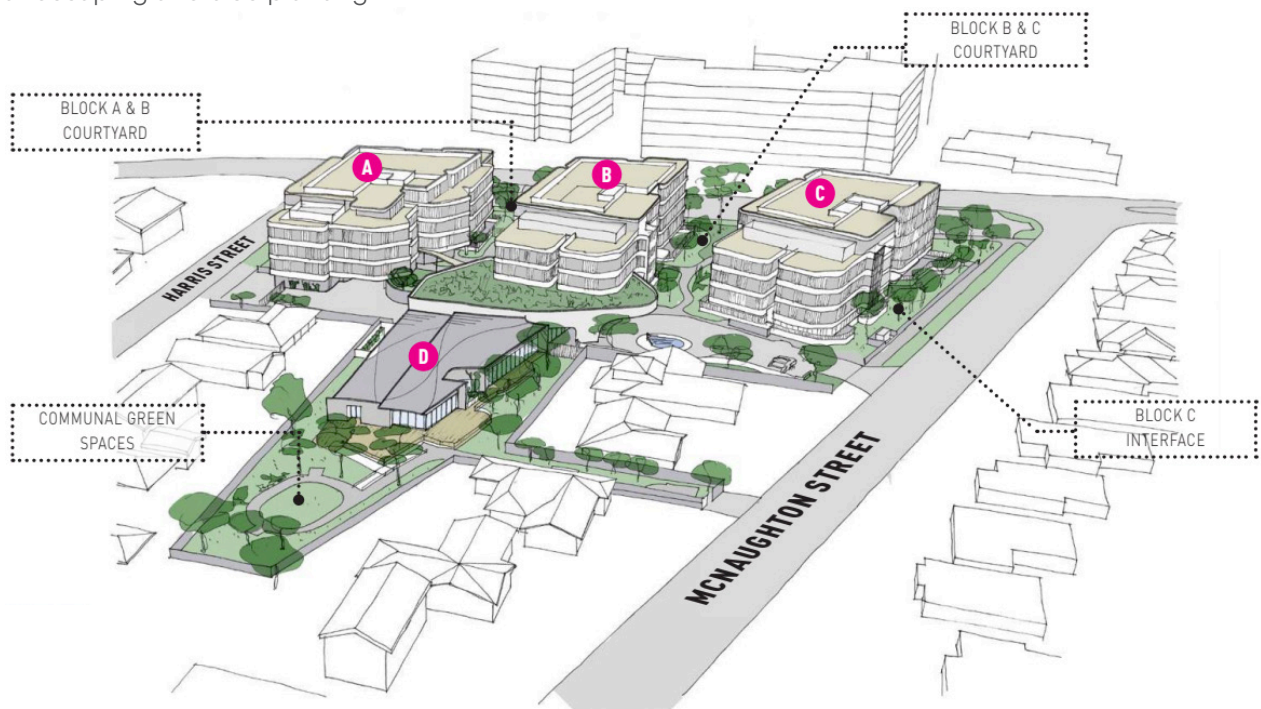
Aerial view of buildings looking north west from McNaughton Street (Source: Jackson Teece)
